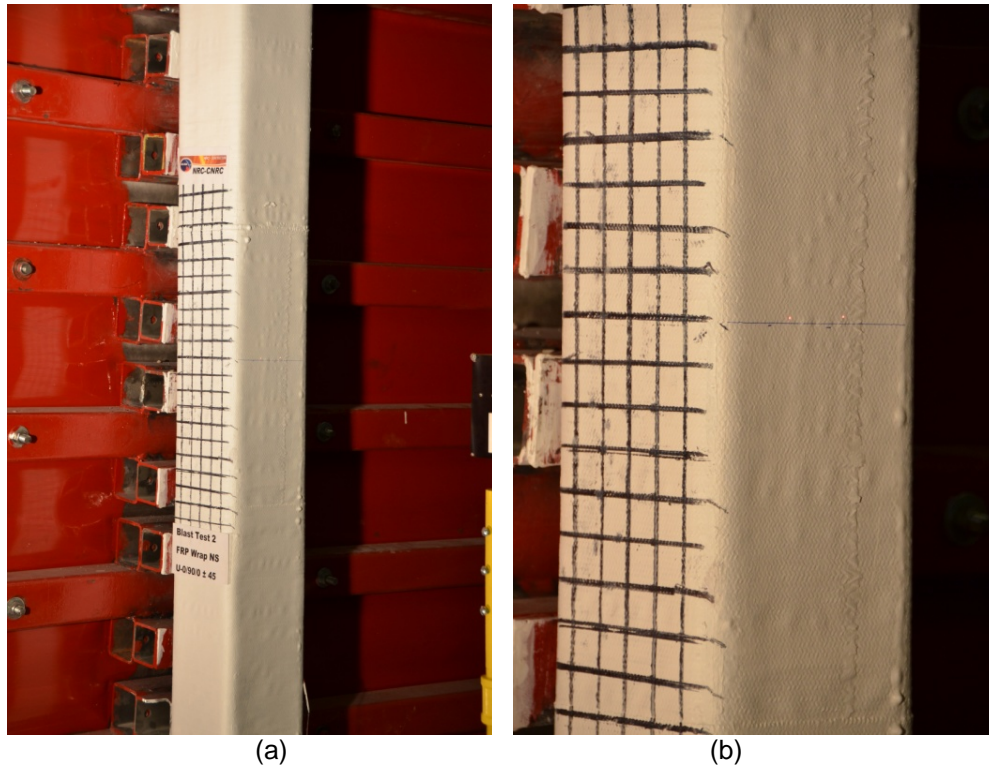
Level of damage of CFRP Col. a) front view b) side view
